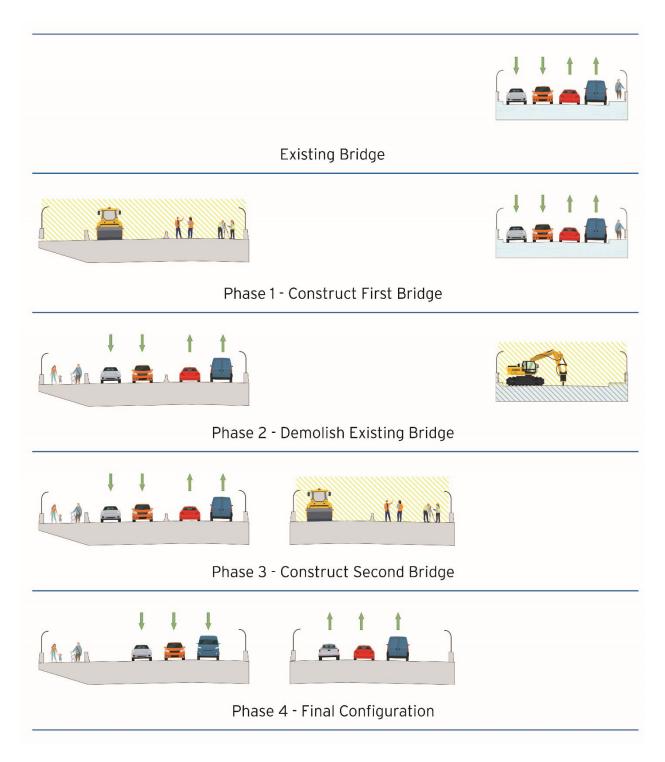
Schematic of Proposed Bridge Replacement Construction Phasing Approach
